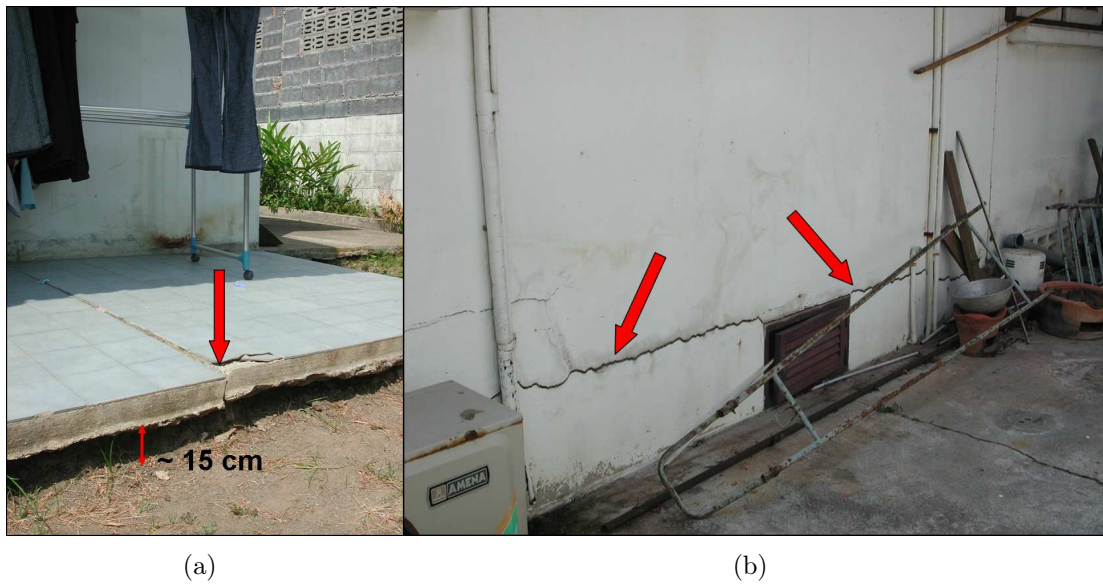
Evidence of subsidence in the study area. (a) shows the basement of a house separated from the ground. (b) shows cracks on the sidewall of the same house.
